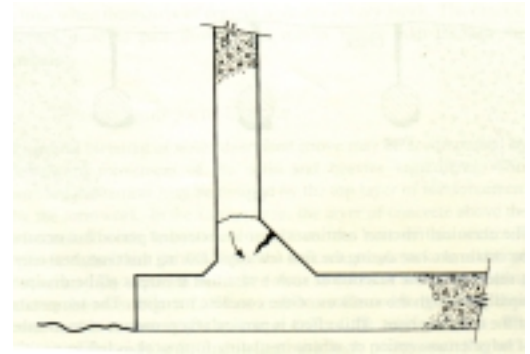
Plastic Settlement Cracking due to Formwork Restraint
